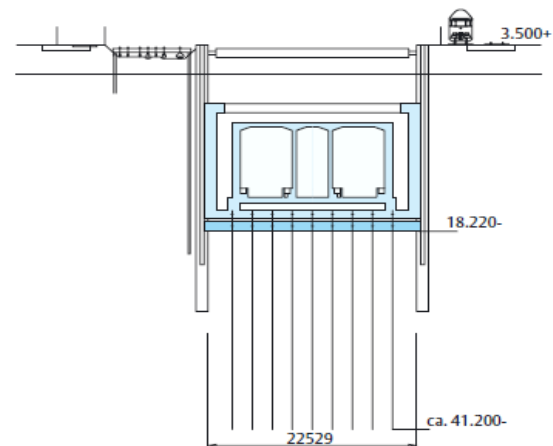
Cross-section of building pit Botlekspoortunnel [25]
